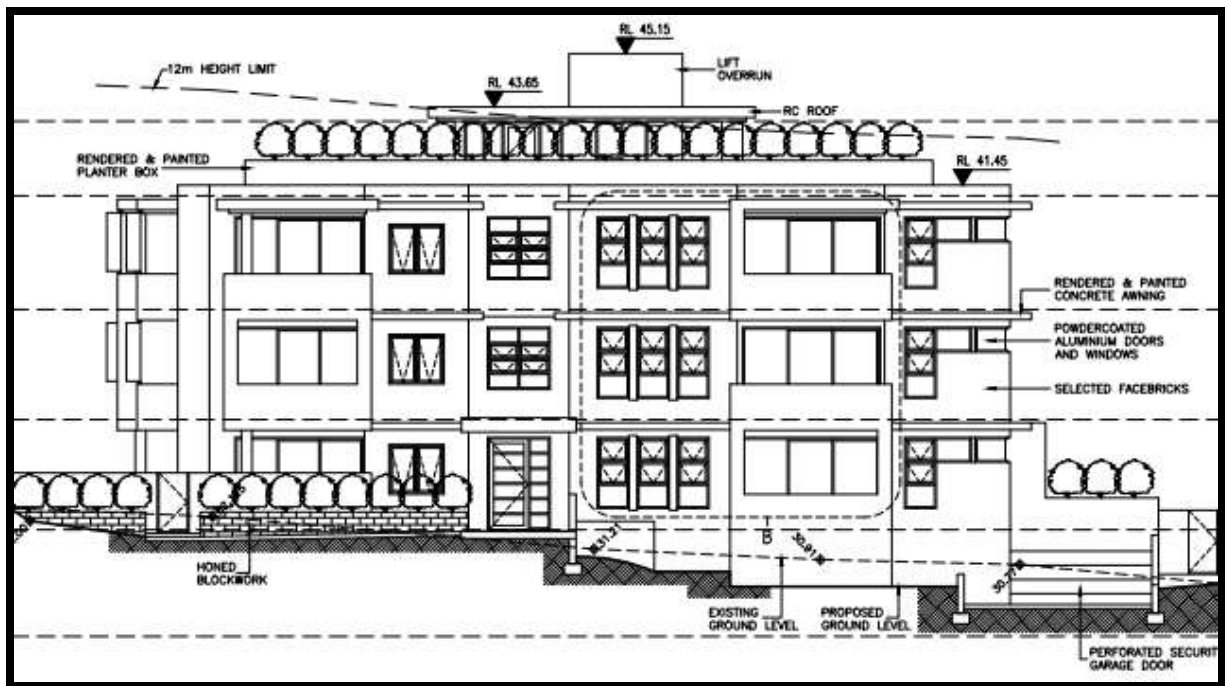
An extract of the proposed development's primary (north east) elevation.
